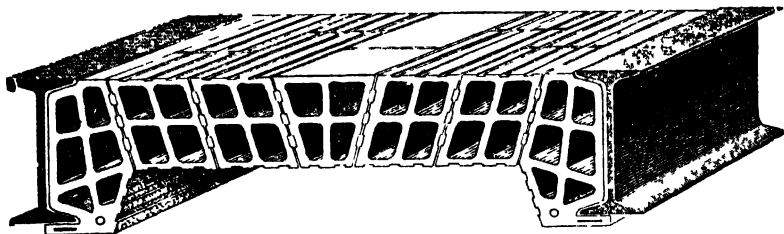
,686 —Hollow tile for flat arches supported on raised skew backs for roofs, etc. This style arch is generally used in cases where beams are deep and no flange finish is required. It will be found useful in connection with flat roofs, thereby saving expense and weight both in bearing and brick.
